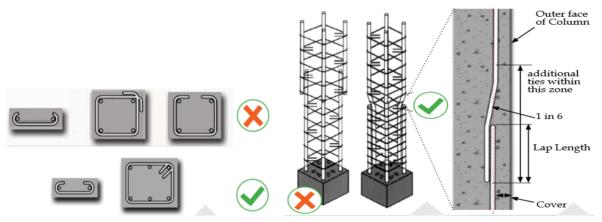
Reinforcement pattern in column and bar bending details (credit: TESRA ppt)
